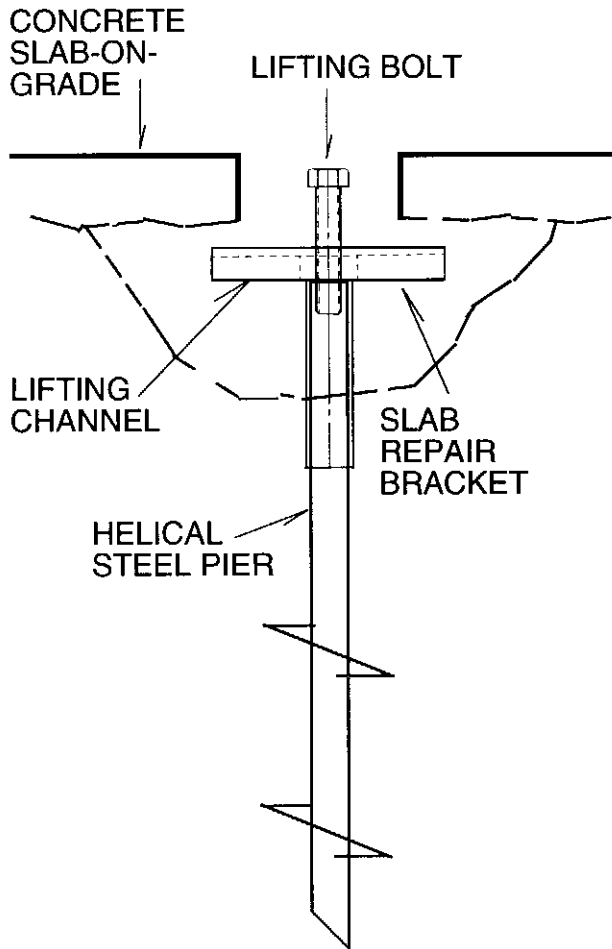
TYPICAL INSTALLATION OF SLAB REPAIR BRACKET
